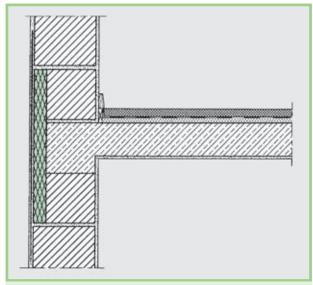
Ideal cold bridge insulation around the ceiling support.
